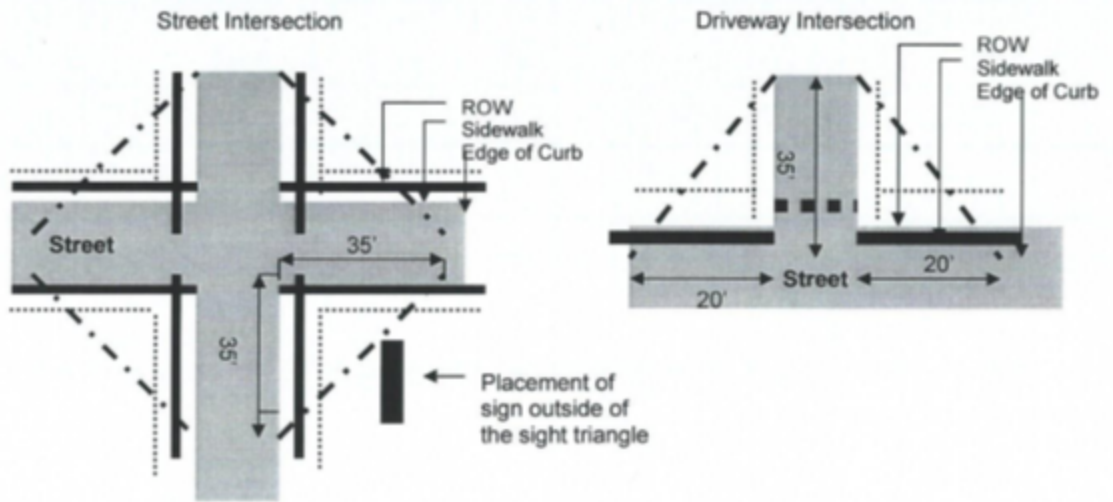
Street Intersection Sight Triangle and Driveway Intersection Sight Triangle
